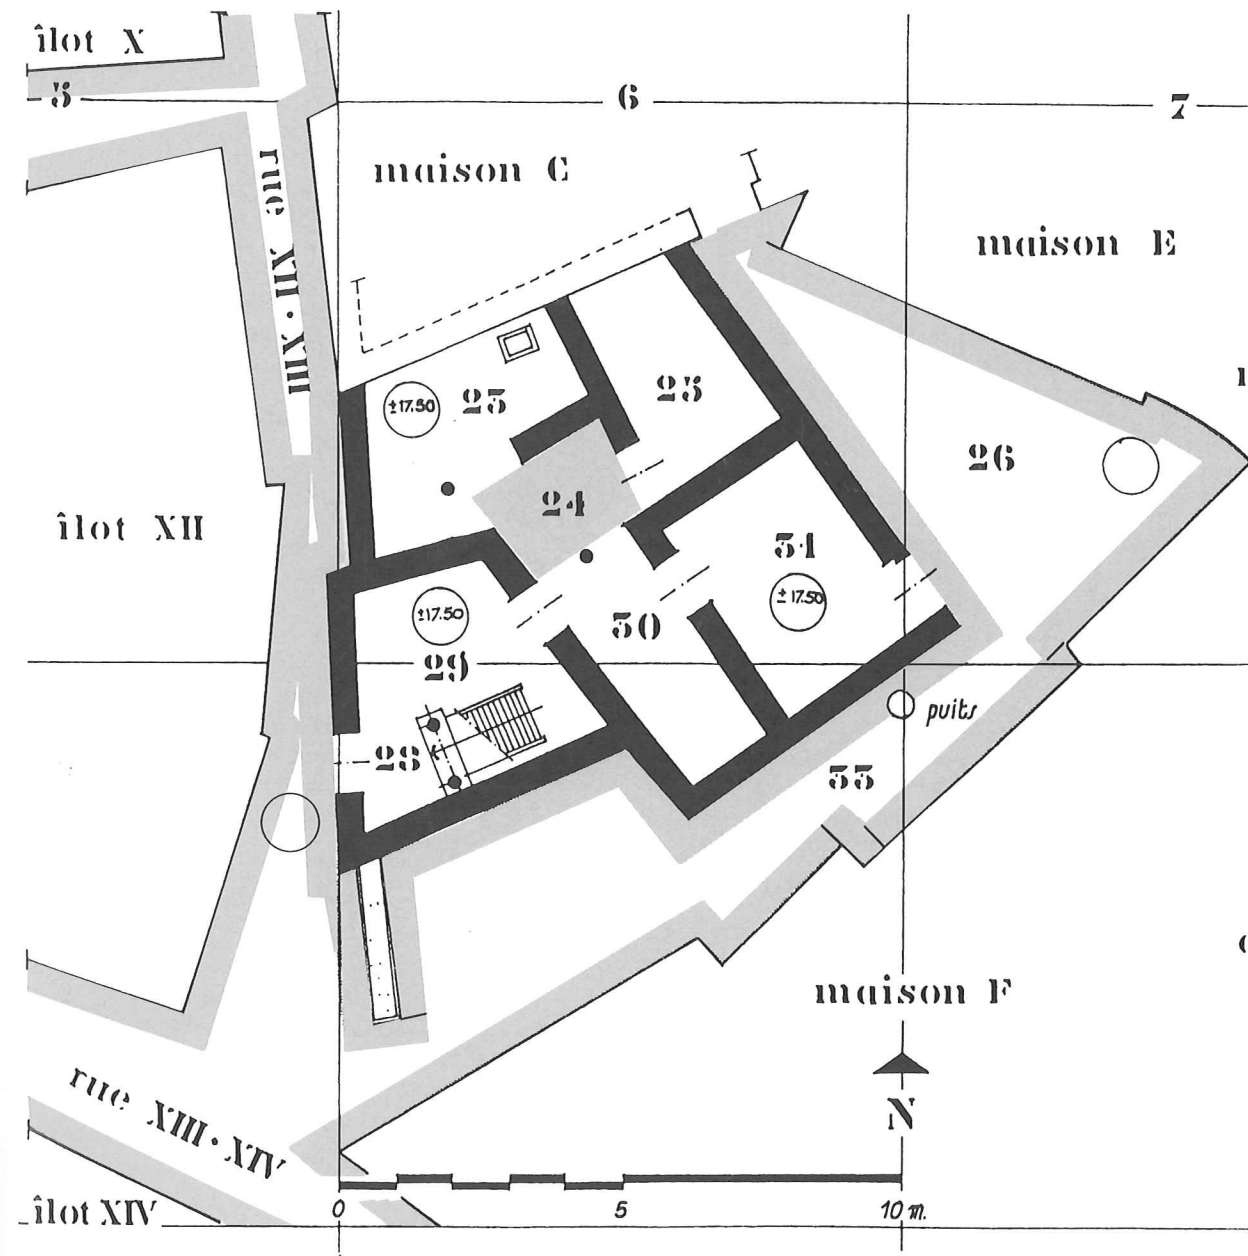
House D, Ville sud: proposed reconstruction of floor plan (after Callot 1994).
